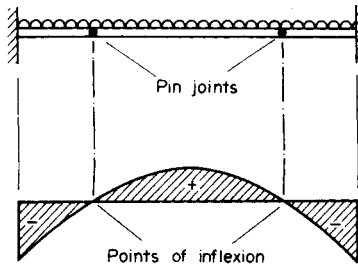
Built-in beam using "double-cantilever" construction.
